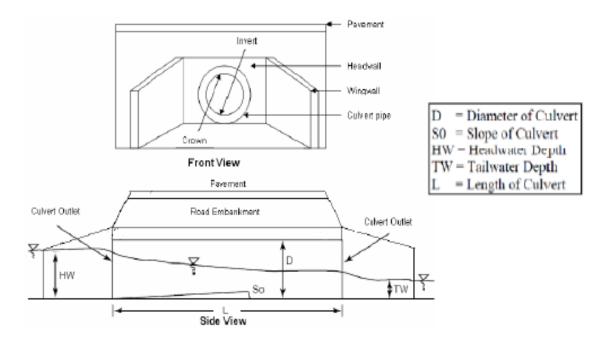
Typical Culvert Components [Source: Najafi, et al., 2008].
